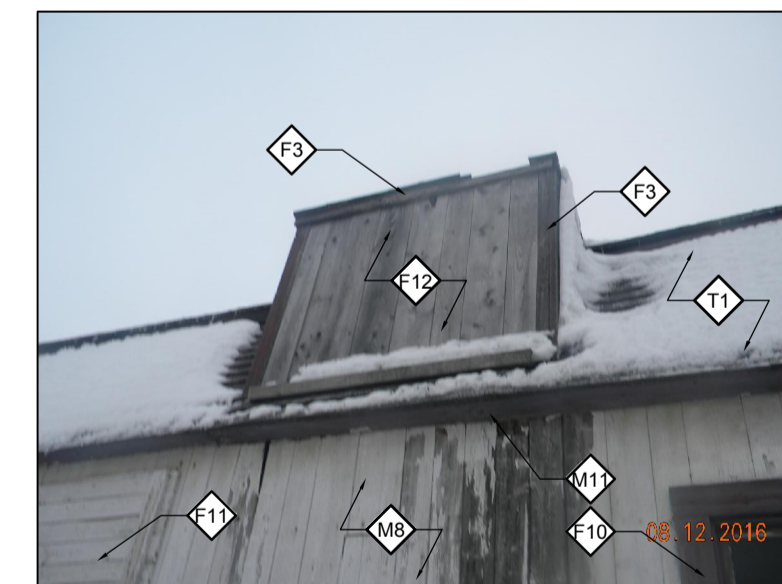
WINDOW DORMER COVERED WITH VERTICAL CLADDING BOARD TO BE DEMOLISHED
